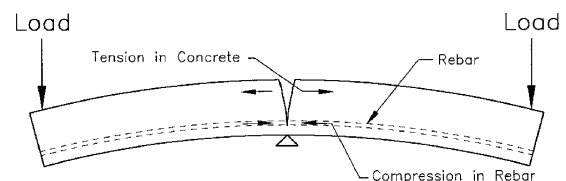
(d)—Incorrectly placed or missing reinforcement is not effective in resisting tension and will allow uncontrolled cracking in the beam.
